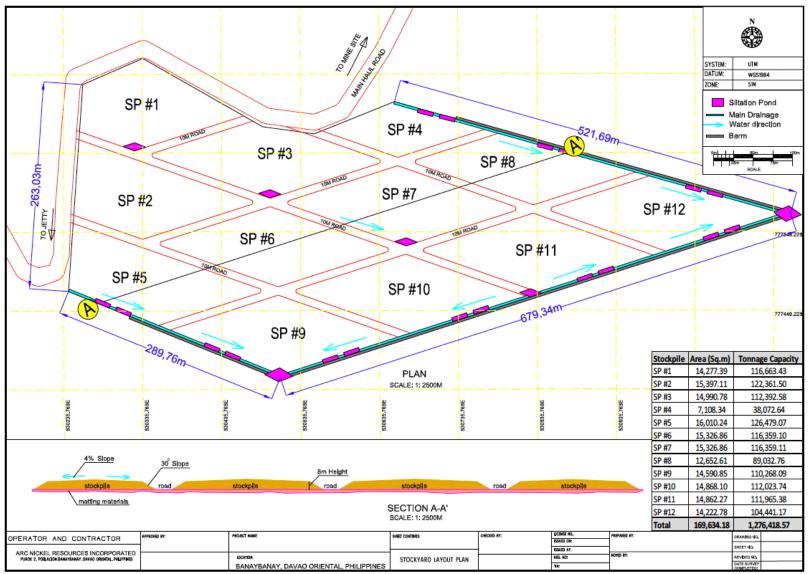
Layout of Stockyard Layout Plan (Source: RCMC)
